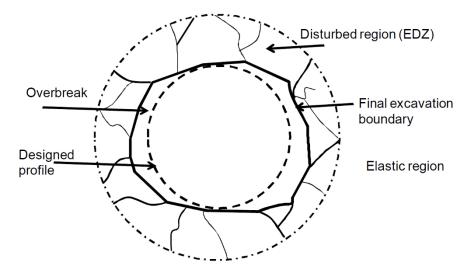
Blast damage zones around and underground excavations (Suorineni, 2009)
